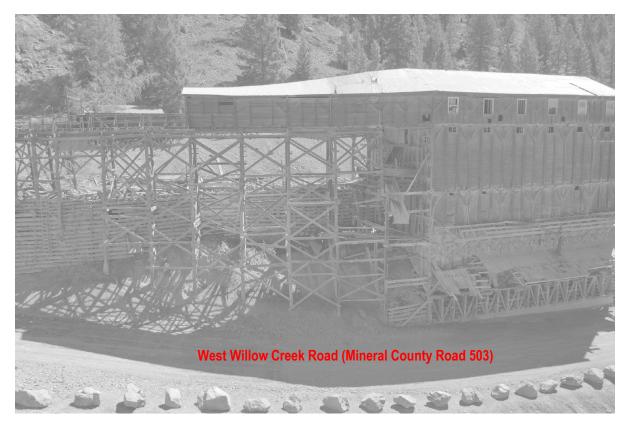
Aerial view of Ore Sorting House building and adjoining covered trestle, view east.
